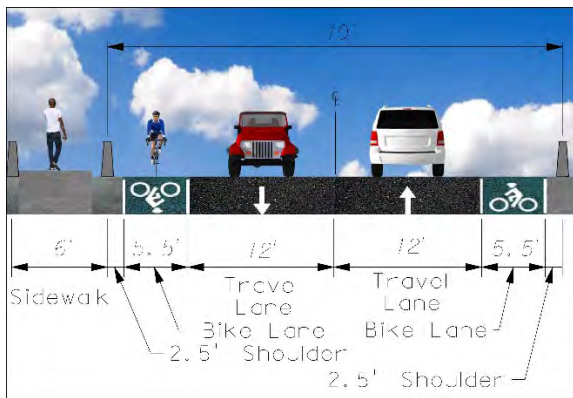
I-94 Bridge to Oregon - Typical Section
